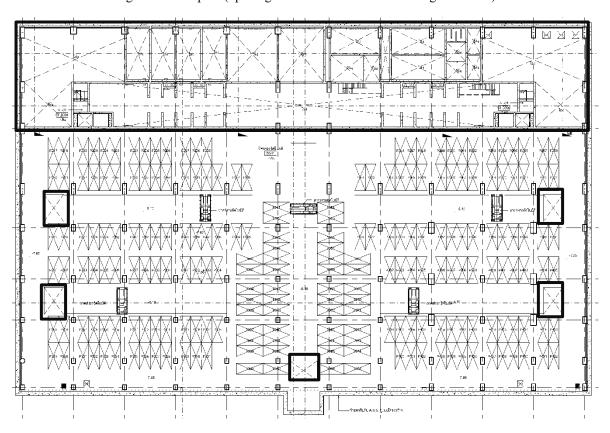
B3 floor plan (openings are marked with bold rectangular boxes)
